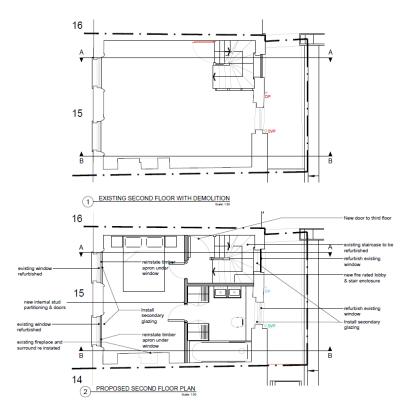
(above): Existing and proposed plans of the second floor showing internal and external alternations proposed
